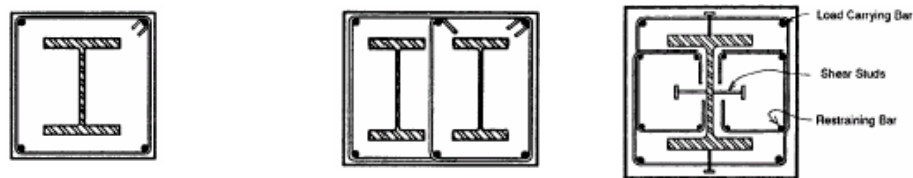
Typical close hoop details for encased composite columns: single (*left*) or double (*middle*) structural steel components and with shear studs (*right*).
